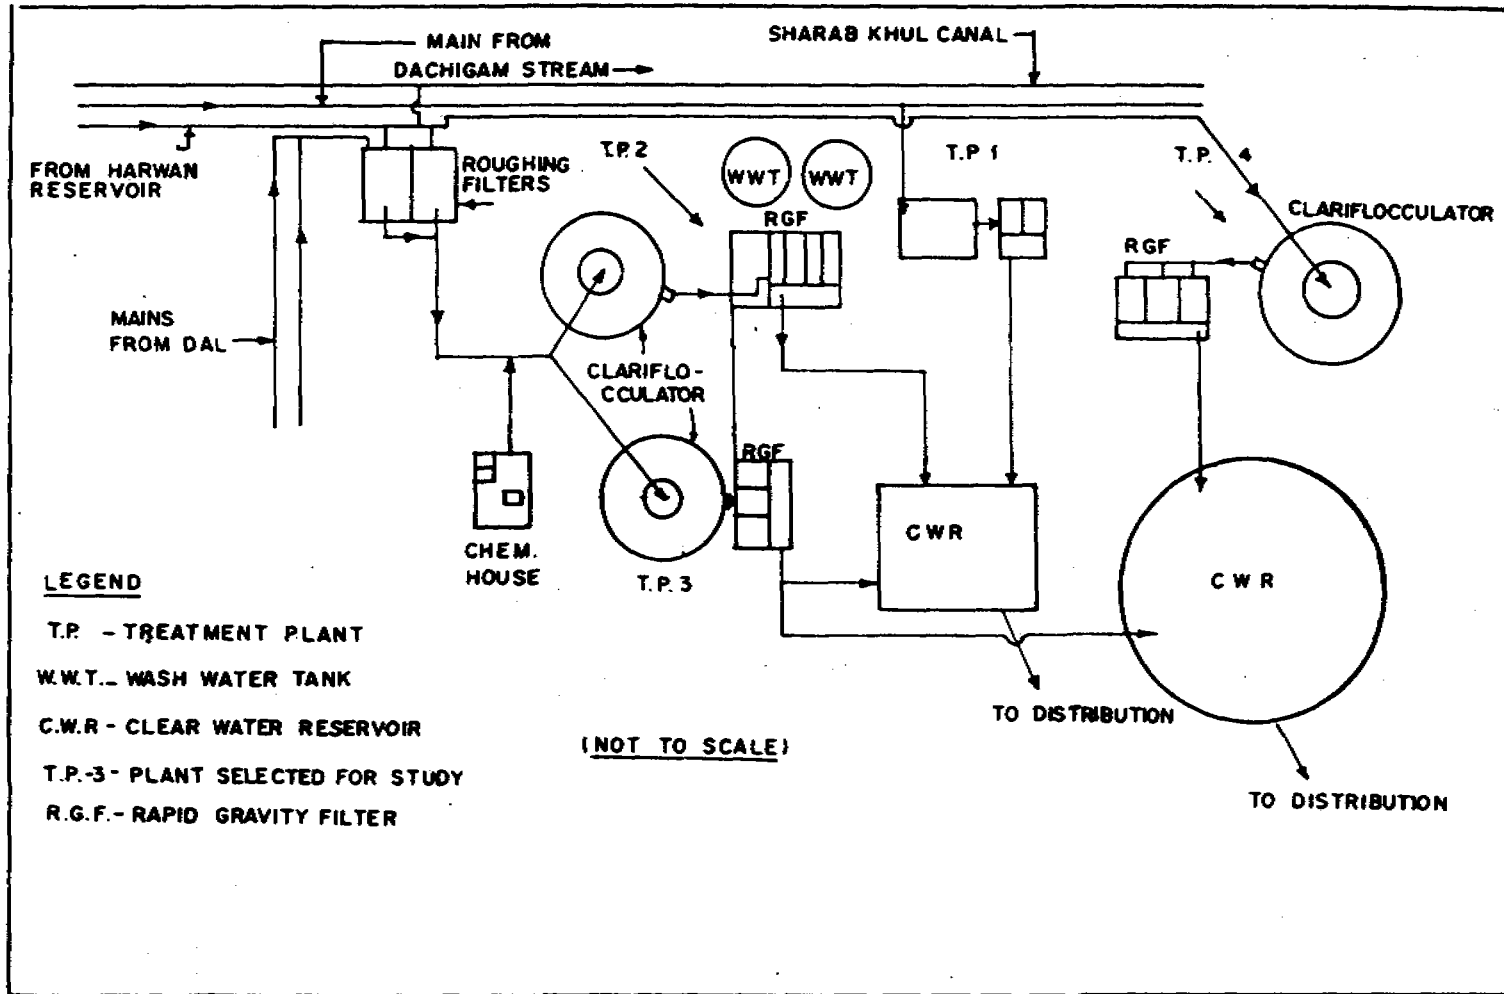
LAYOUT PLAN OF NISHAT WATER WORKS, SRINAGAR
